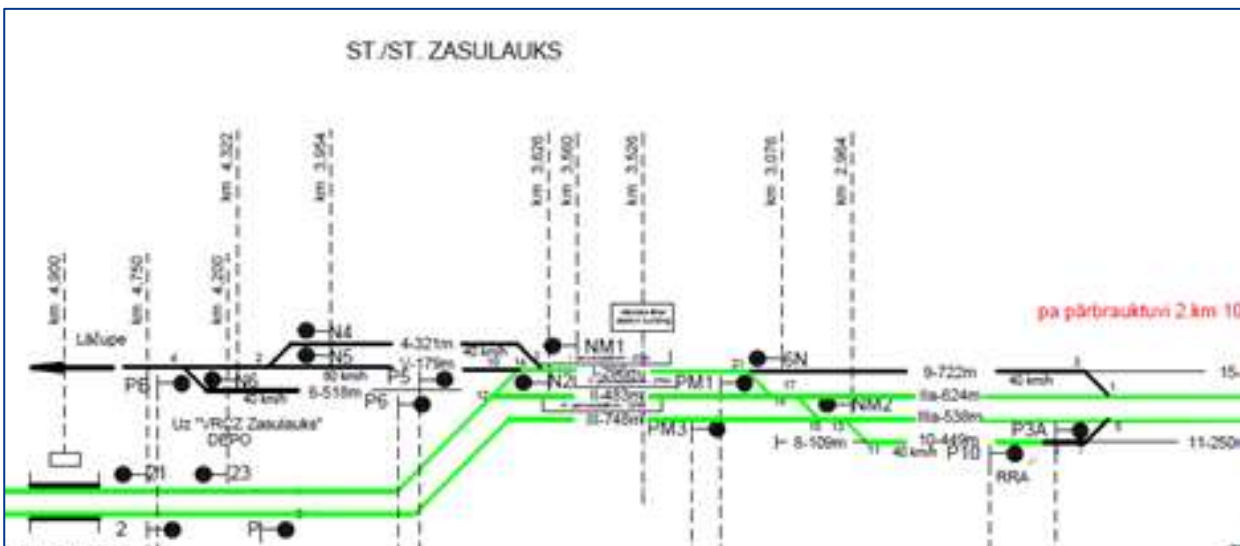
Zaslauks station – schematic track layout⁴⁸
